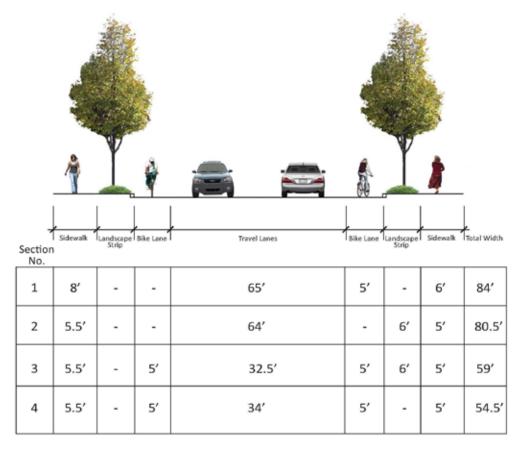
Existing Typical Sections (see page 6 and 7 for locations)
